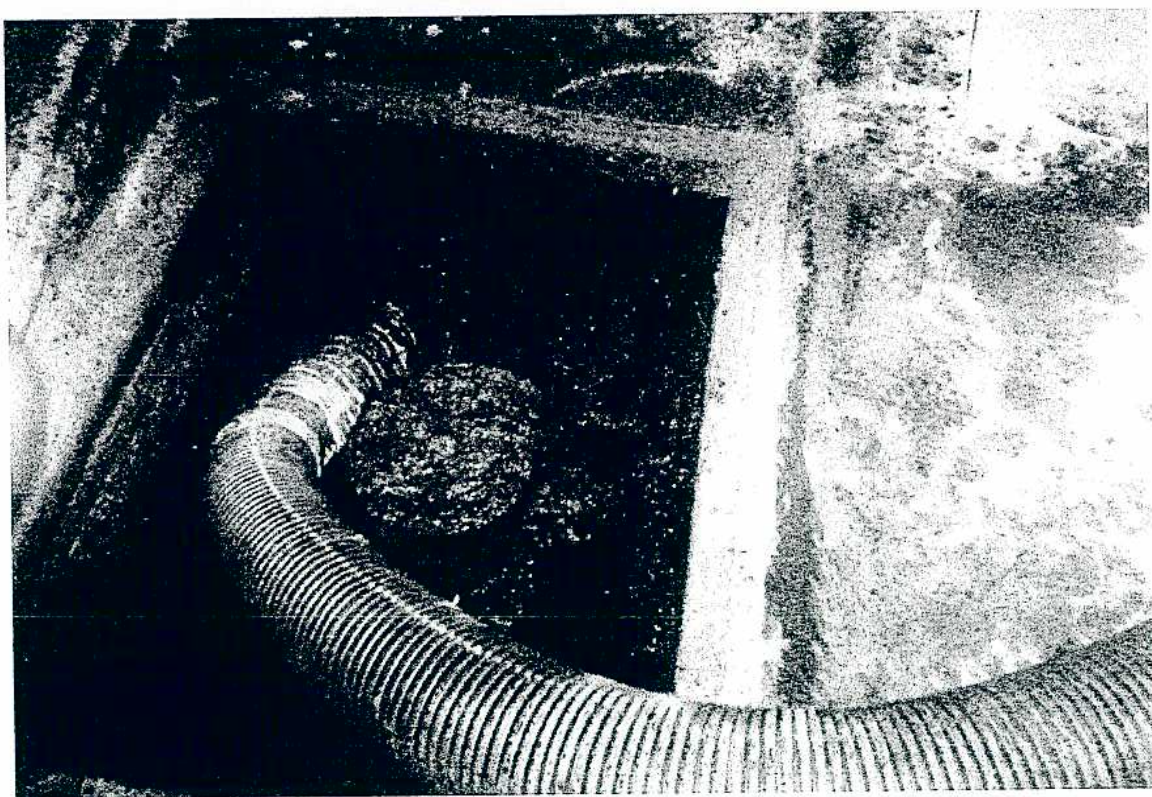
Pumping water and sediment from well head area in Building 4 Pit.
